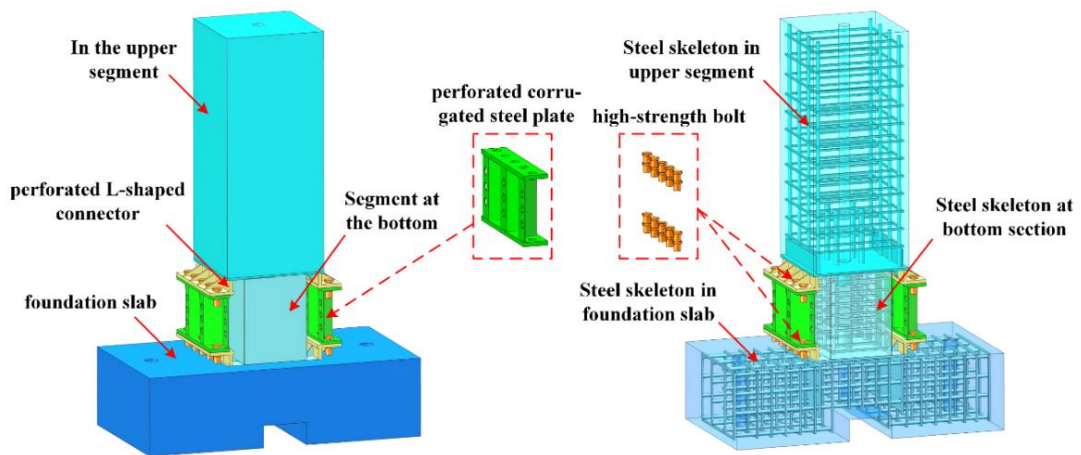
Fabricated bridge piers with external perforated corrugated steel plates
